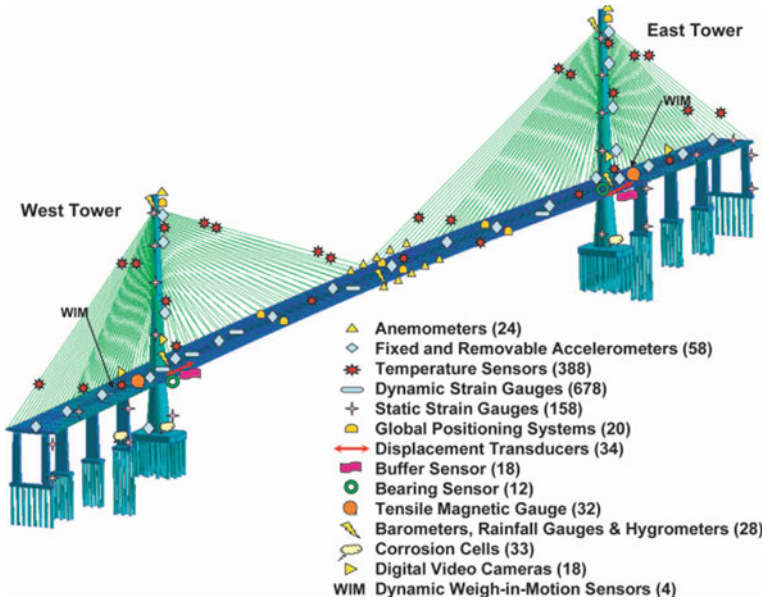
SHM monitoring system in Stonecutters Bridge [10]
